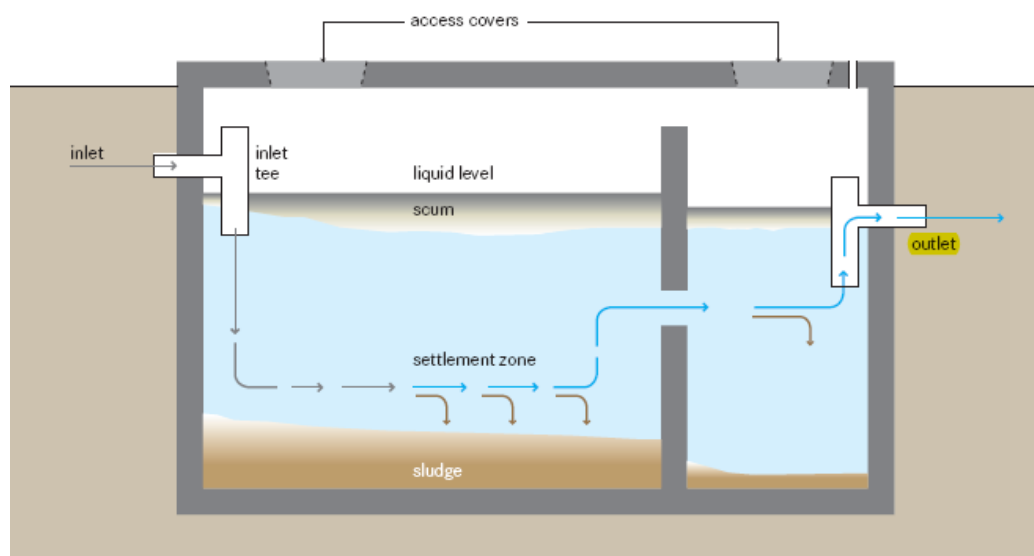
Design scheme for a Septic Tank (TILLEY et al., 2008)
